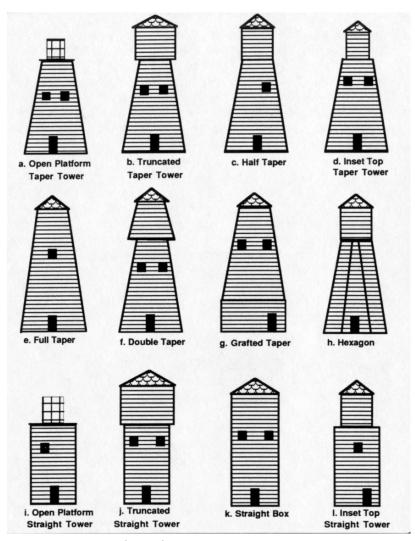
Tankhouse types in California (from Leon S. Pitman, "The Domestic Tankhouse," page 16.)
